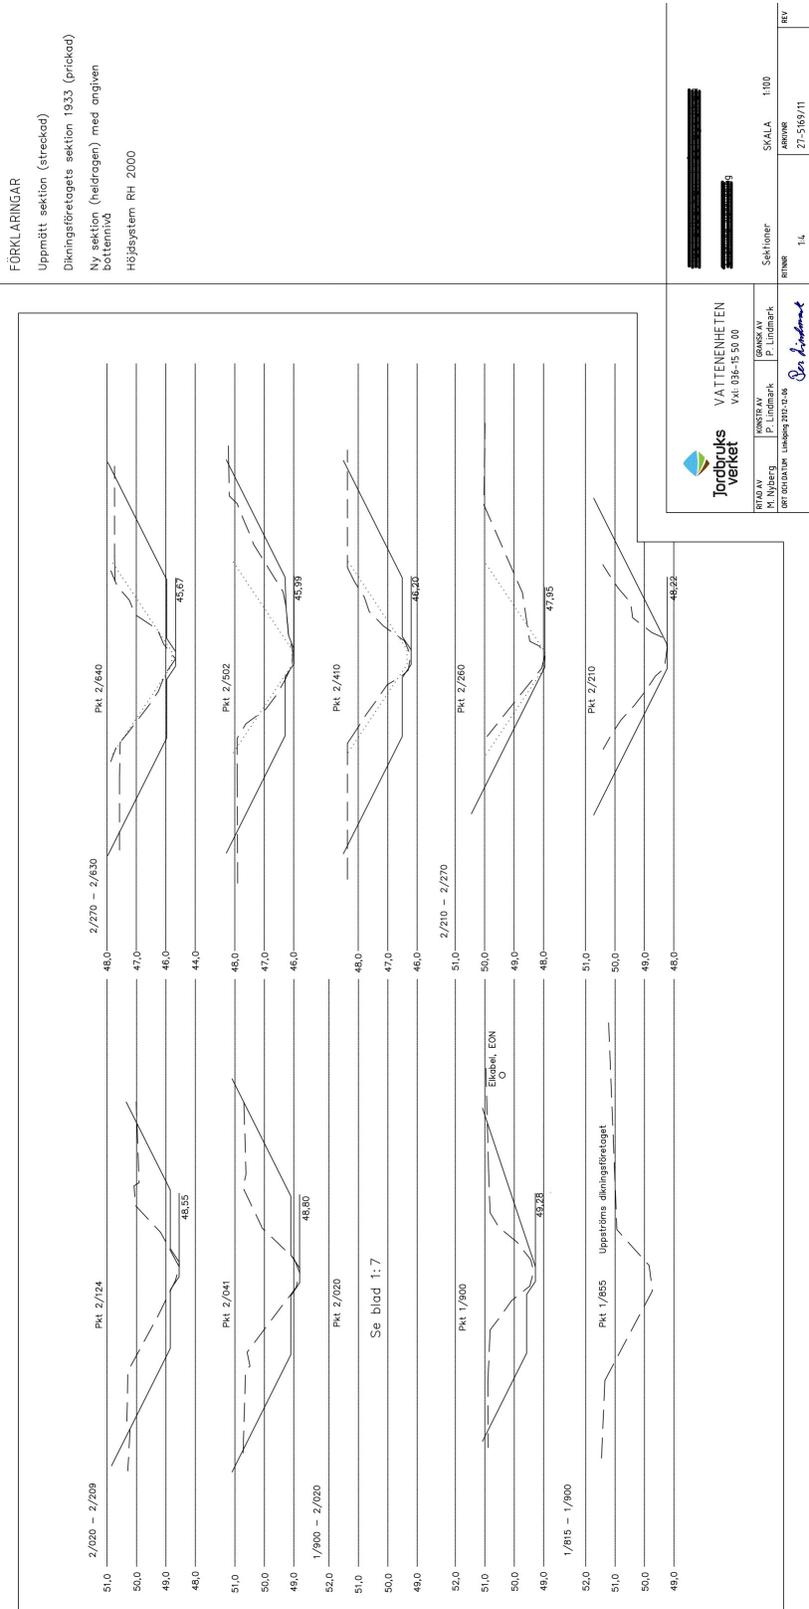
Plan 1.4 for cross sections of reference two-stage ditch for planned construction, by Jordbruksverket (2012)
